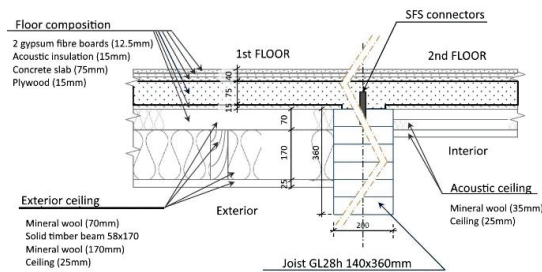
Cross-section of the TCC floor for the first floor (left) and the second floor (right)
